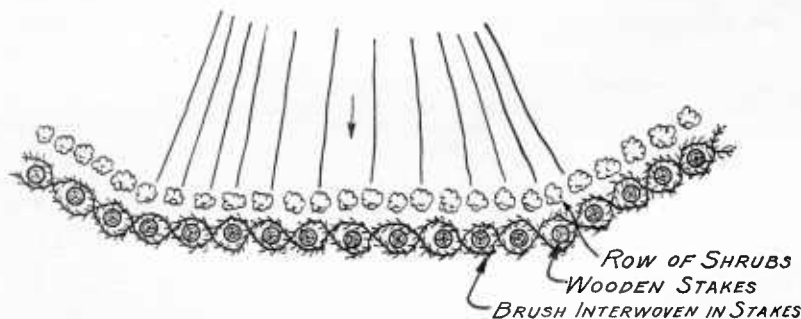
A row of stakes gives protection to shrubs planted below an outlet until they have become established.
